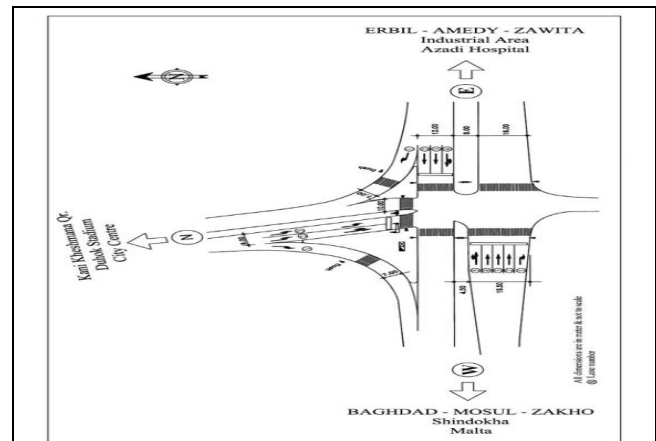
Raza Intersection (R) Plan (Directorate of Traffic, Traffic Engineering Department, Duhok City, 2009)
